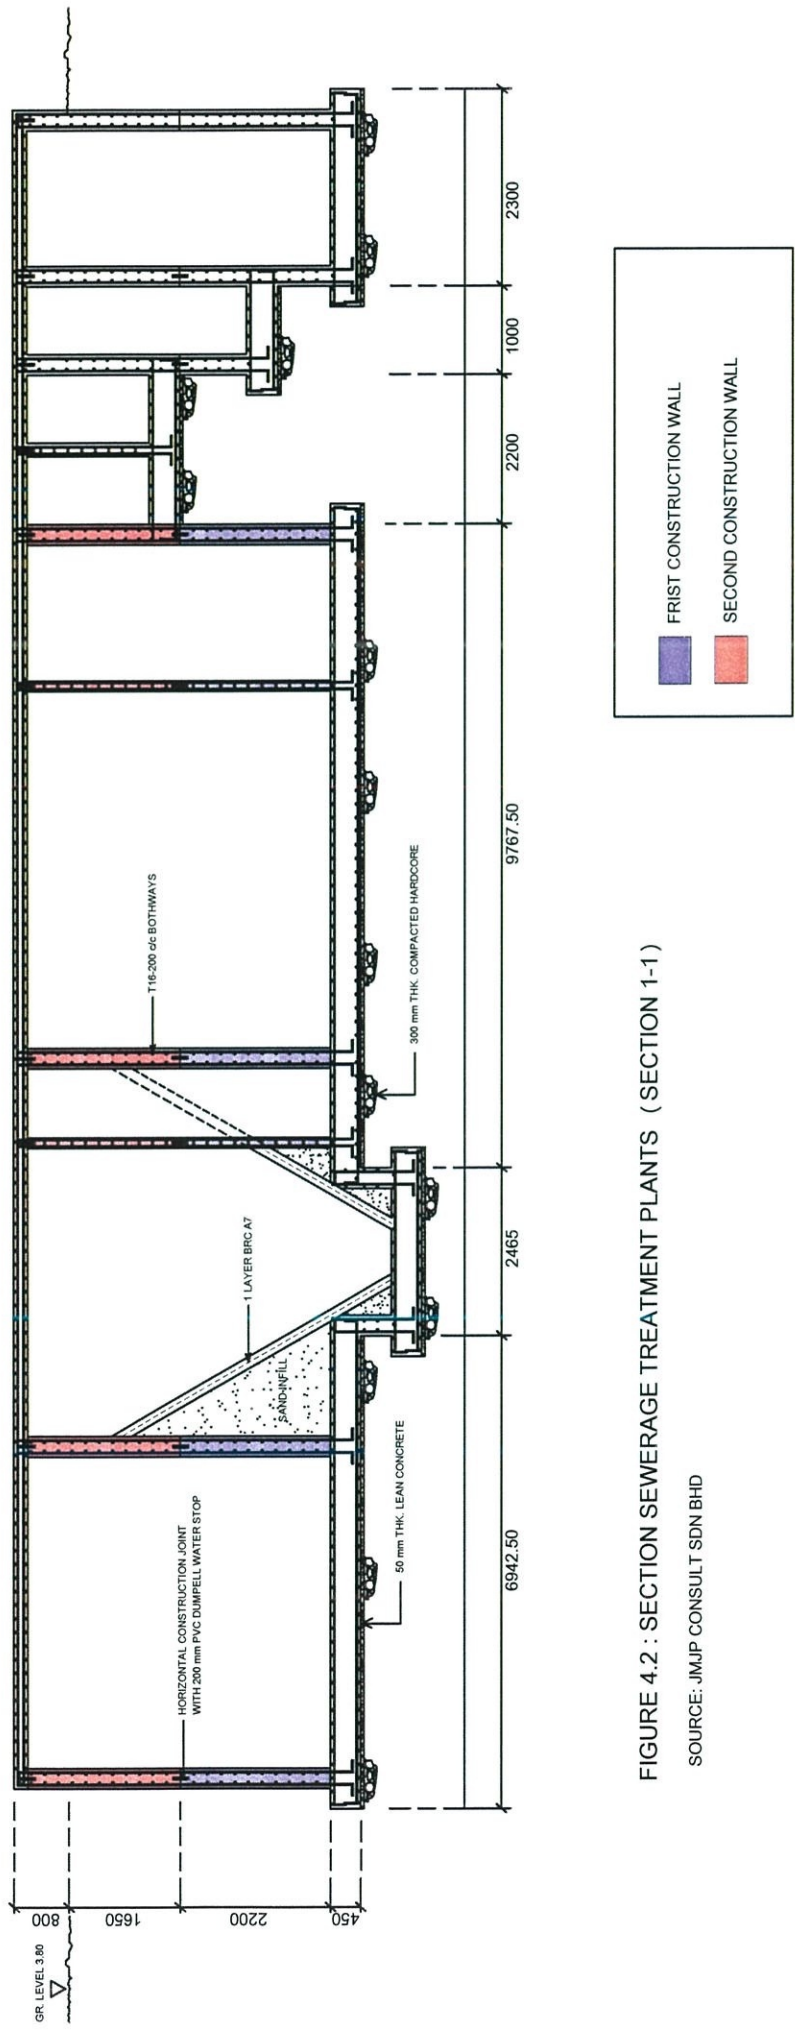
SECTION SEWERAGE TREATMENT PLANTS (SECTION 1-1)
